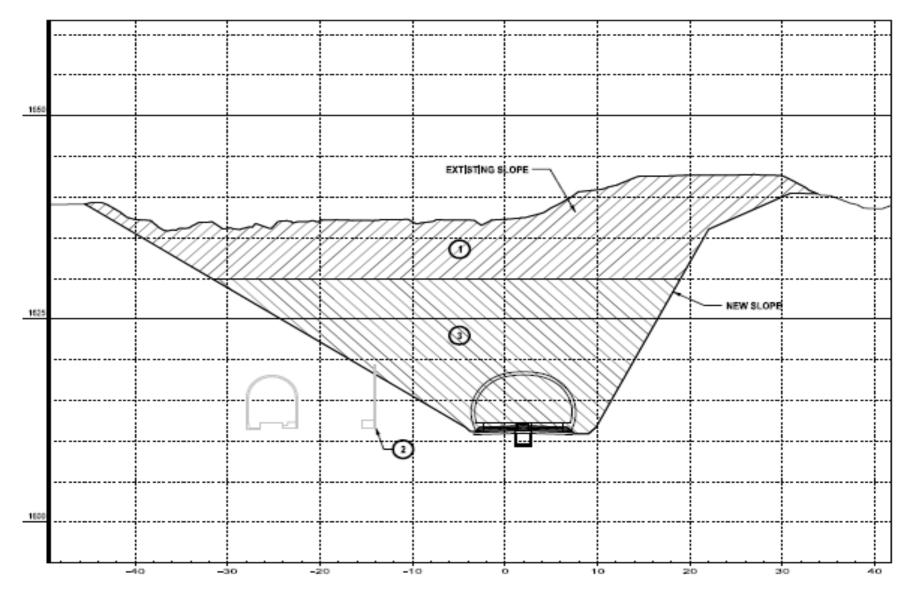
EXISTING AND NEW TUNNEL CROSS-SECTION AT WESTEWRN PORTAL (AURECON; 2014).
